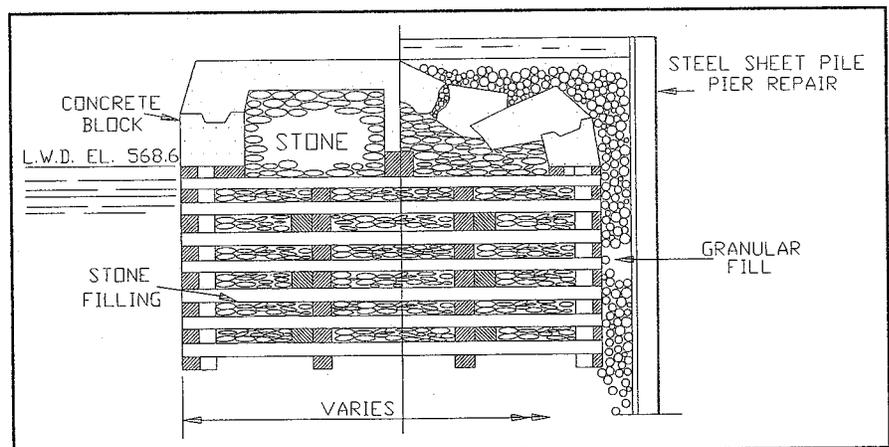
Section of North Pier, Erie, Pennsylvania. Original construction 1825-1900 of vertical-faced, stone-filled timber crib. Later repair included steel sheet-pile facing with granular fill.
